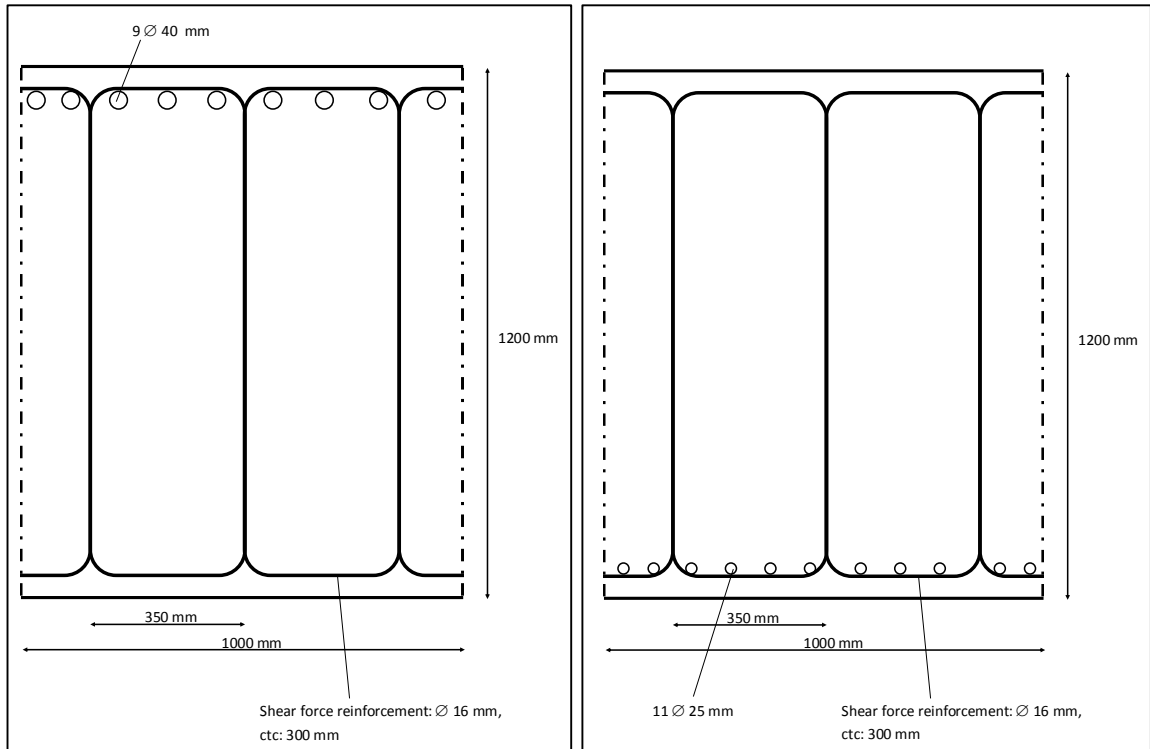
Required reinforcement in the bottom slab (1 m width) Left: above diaphragm wall, right: above foundation piles
